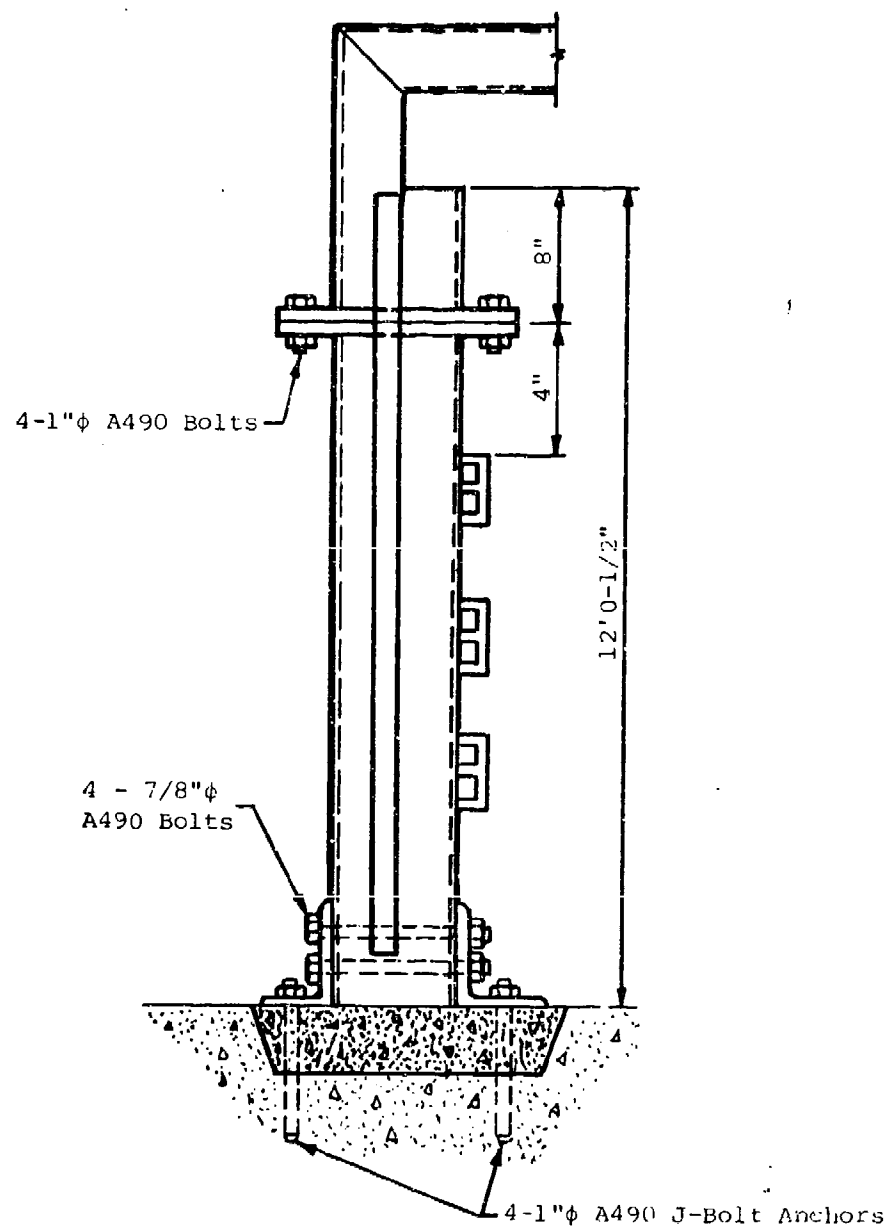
Milan 81-mm Suppressive Shield Removable Column
